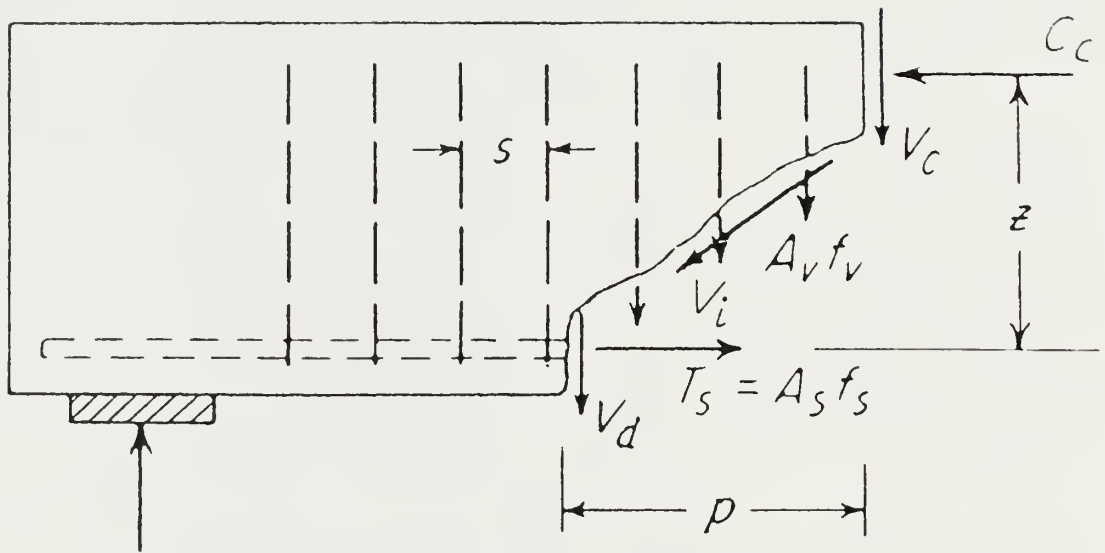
Forces at Diagonal Crack in Beam with Vertical Stirrups[21].
